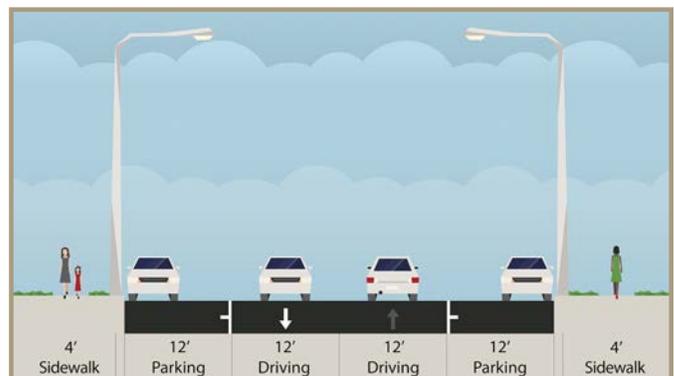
Looking south on Center Street south of Willow Avenue, existing conditions.
